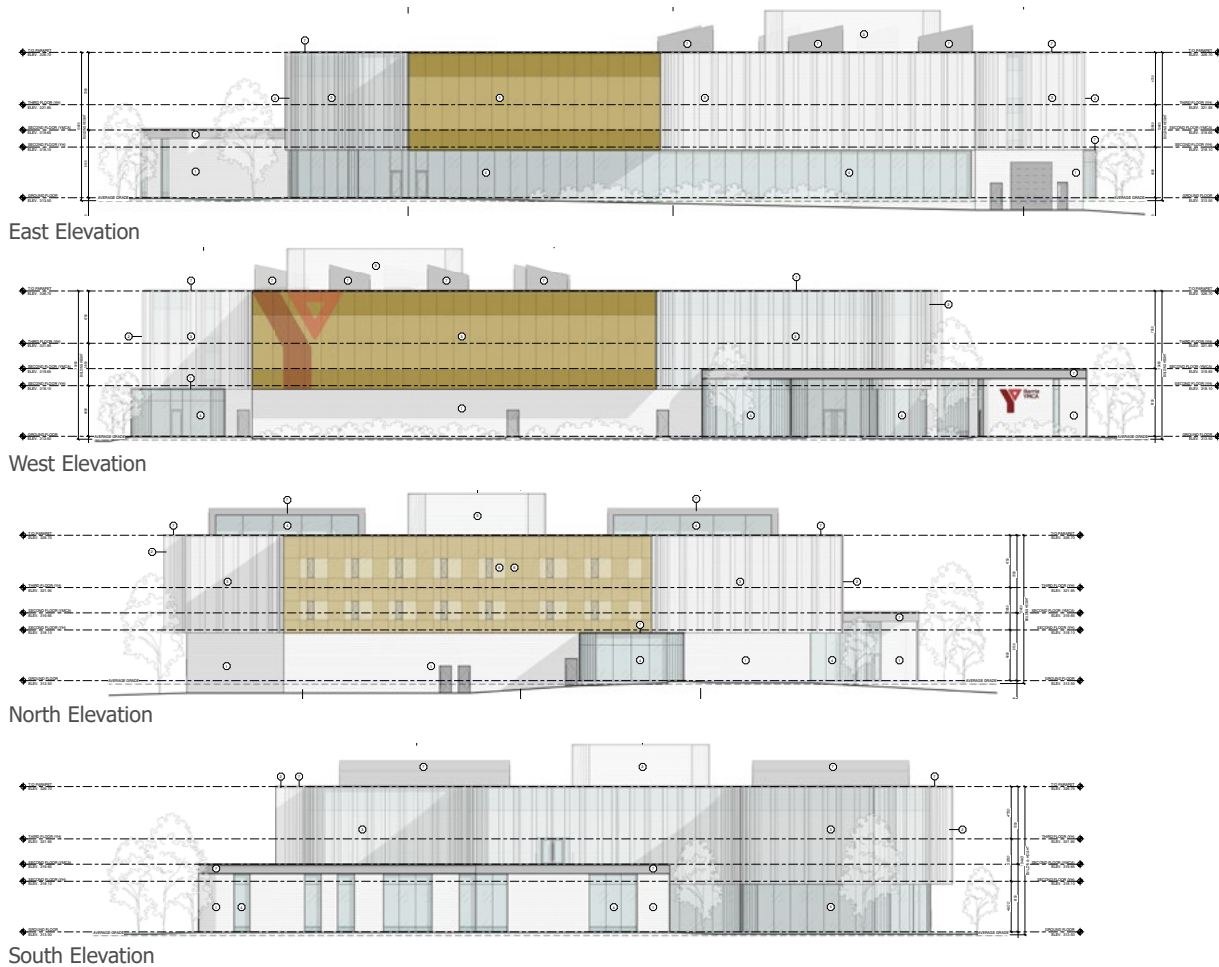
Building Elevations by Martin Simmons Sweers Architects
